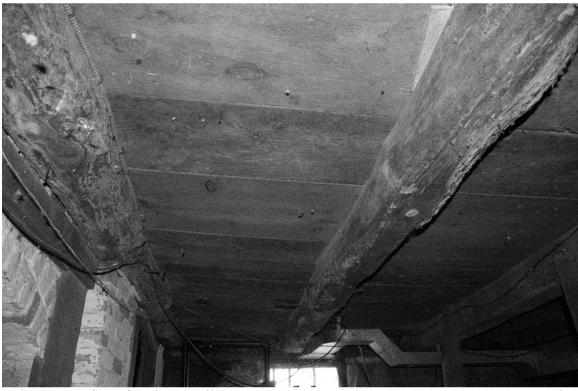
basement, floor framing detail Reference (file name): PIC_0604
